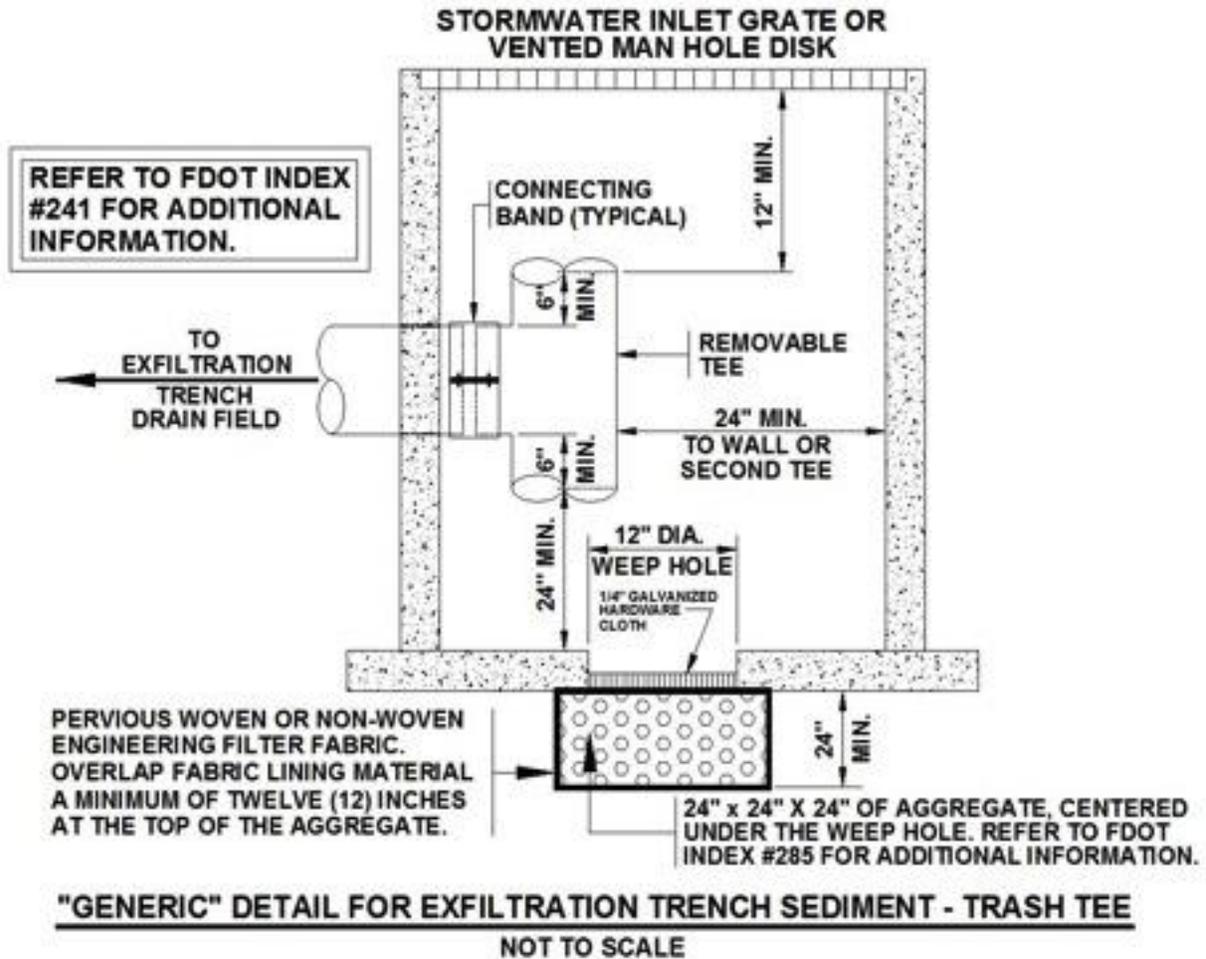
Generic Detail for a Typical Exfiltration Trench Trash Tee
